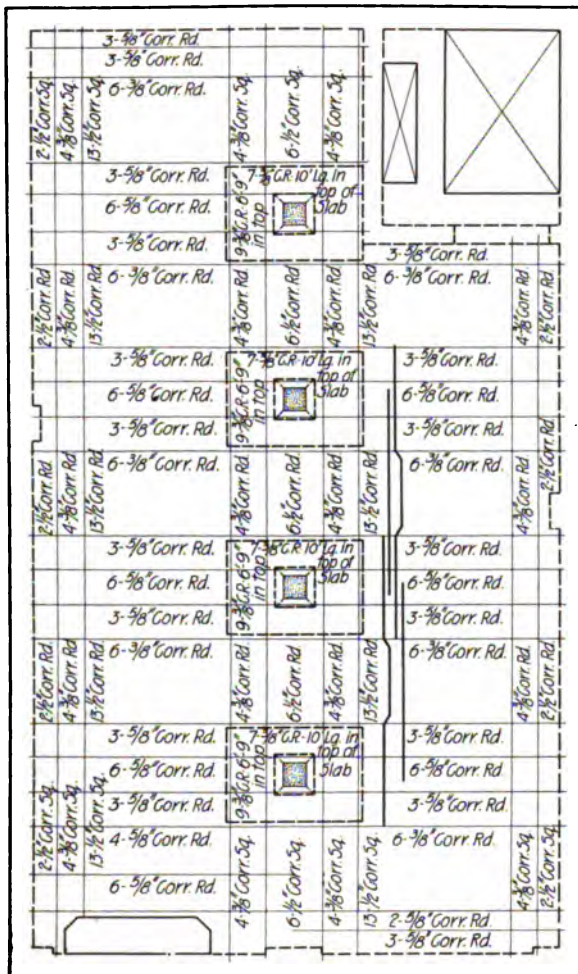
PLAN OF POWERS BUILDING, BASEMENT AND FIRST FLOOR.
